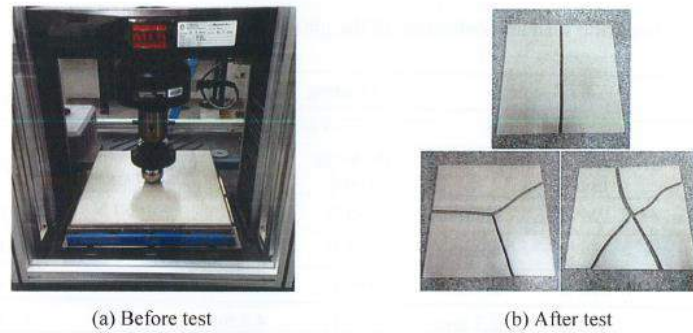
Testing tiles to failure on a normal test rig (Sun *et al.*, 2015)
